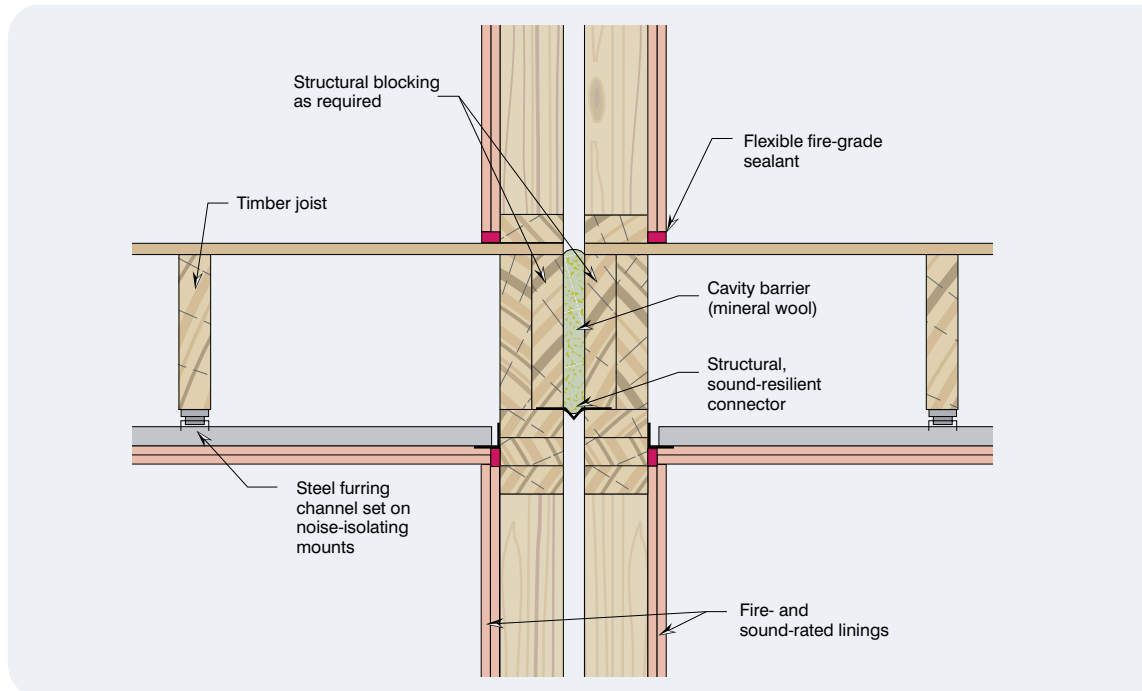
Joists running parallel to bounding wall – elevation view.
